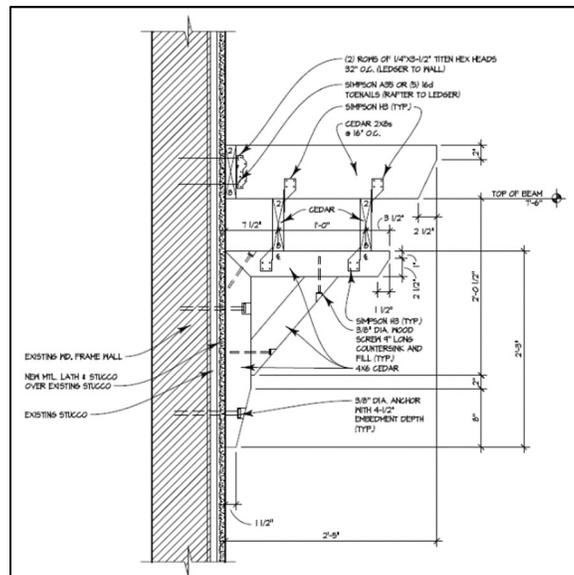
Proposed trellis above garage doors. Image provided by applicant and not to scale.
